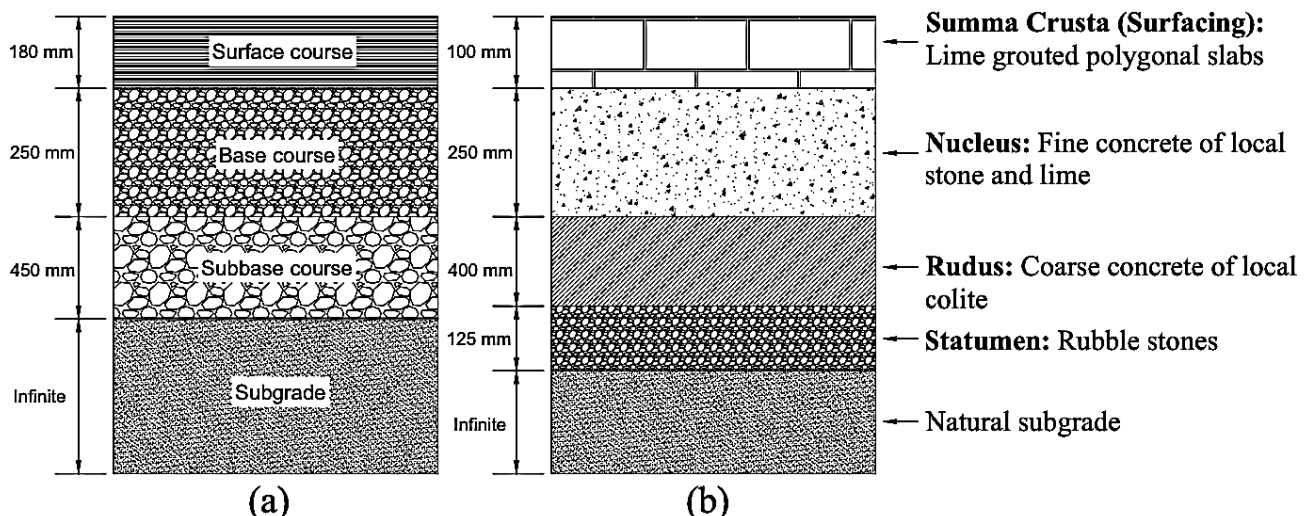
(a) Typical pavement structure used in present time, (b) Roman pavement structure used in Bronze Age
